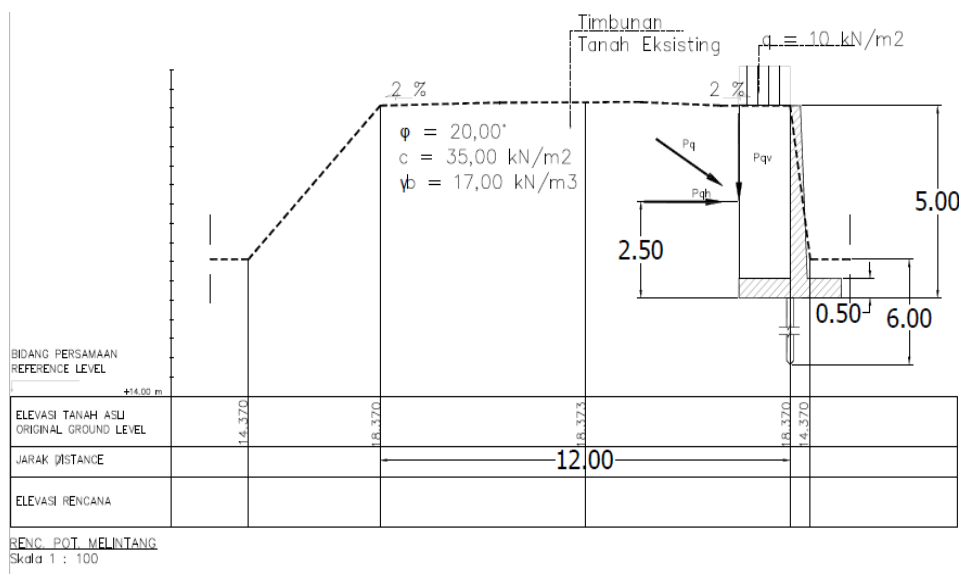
Active earth pressure diagram due to additional surcharge (q') on cantilever retaining wall
